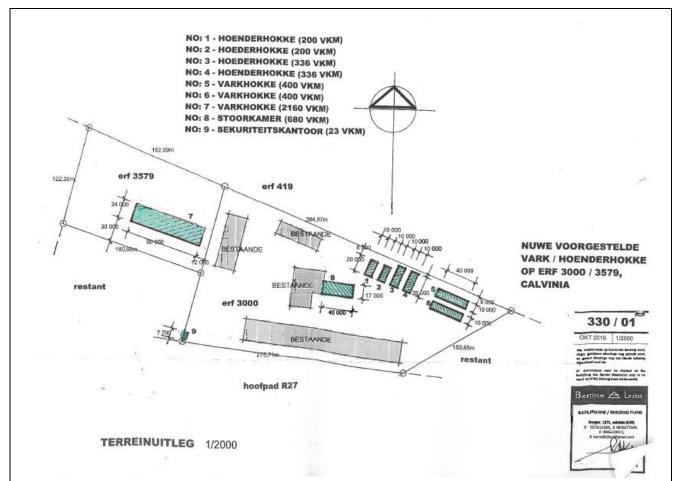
Terrain Plan that was submitted with building plans to Hantam Municipality. The map shows the constructed pig sheds; sheep feedlot; and chicken pens. The structures named 8 and 7 does not form part of this rectification application; and has not been constructed. A new Basic Assessment will be undertaken for structures on Erf 3579.
